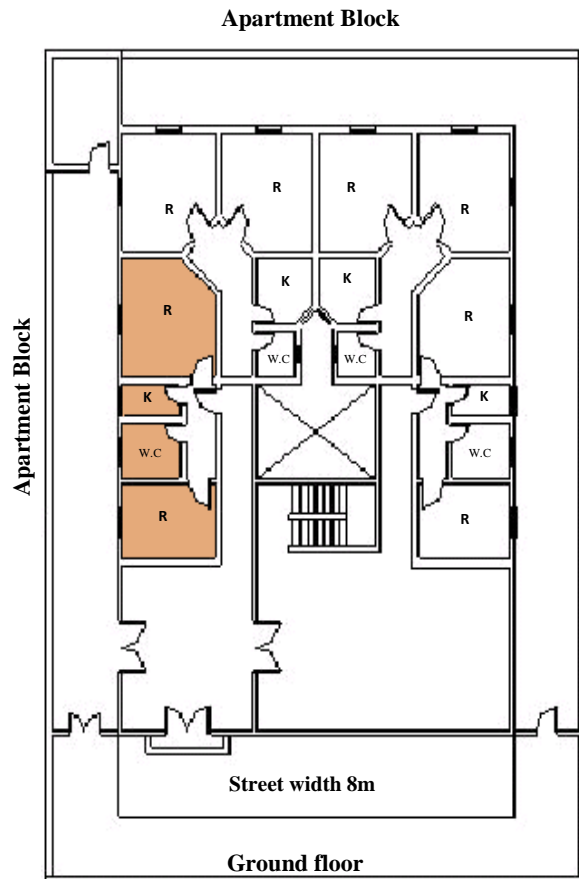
Ground floor plan of Rubat Badr al-Din
